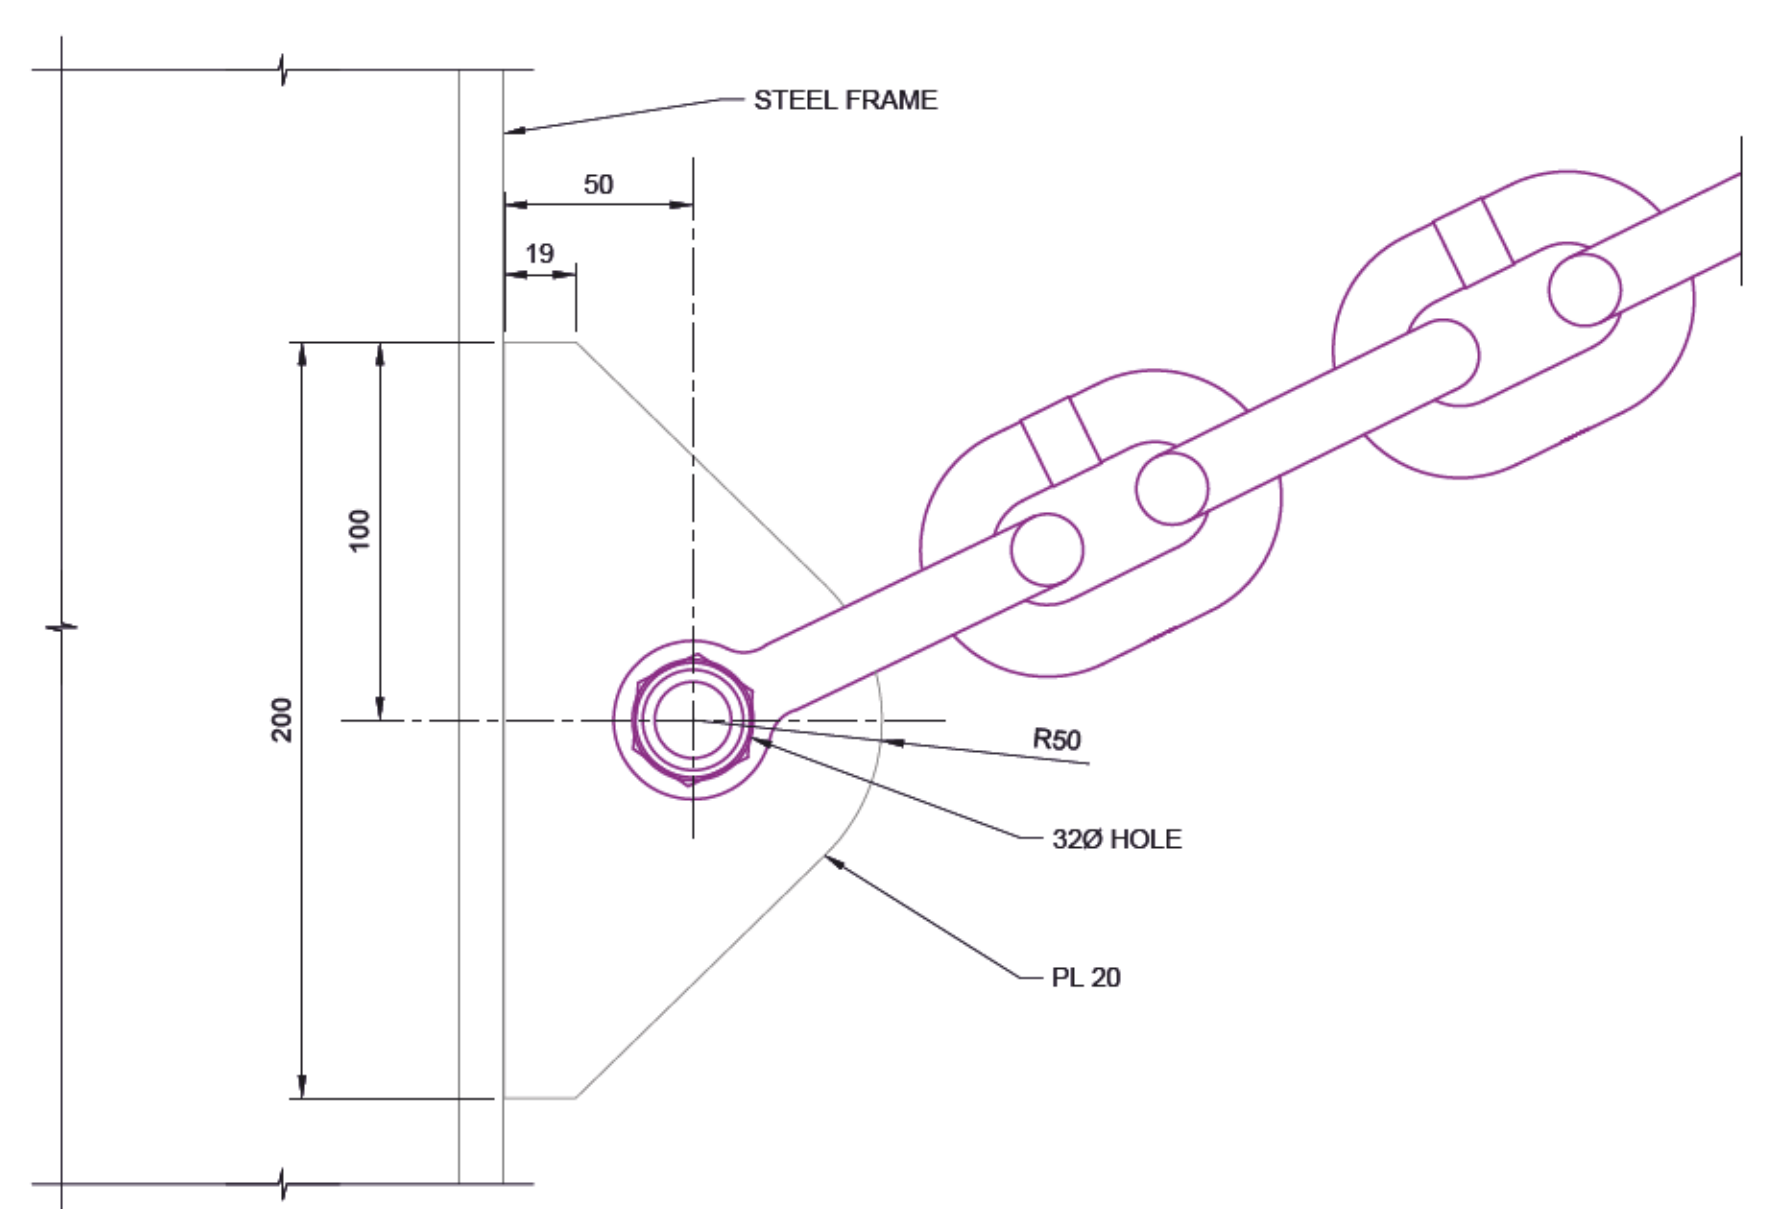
EXISTING SLED ANCHOR (A1 AND A4)
